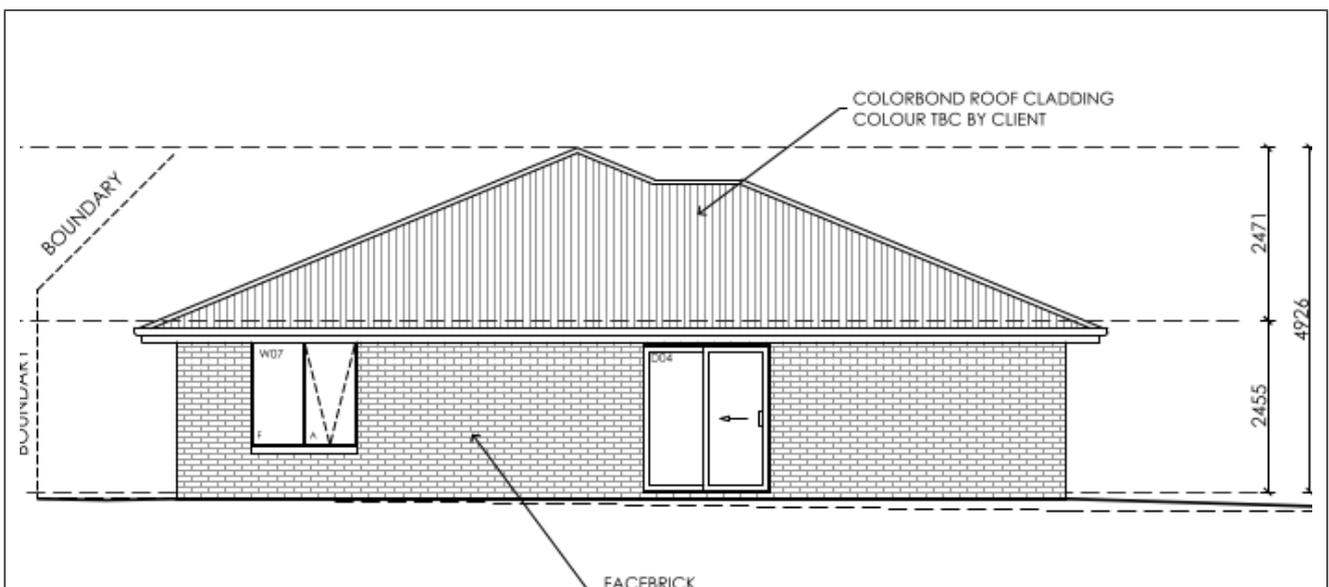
Eastern elevation (Source: RFS Projects Pty Ltd)
